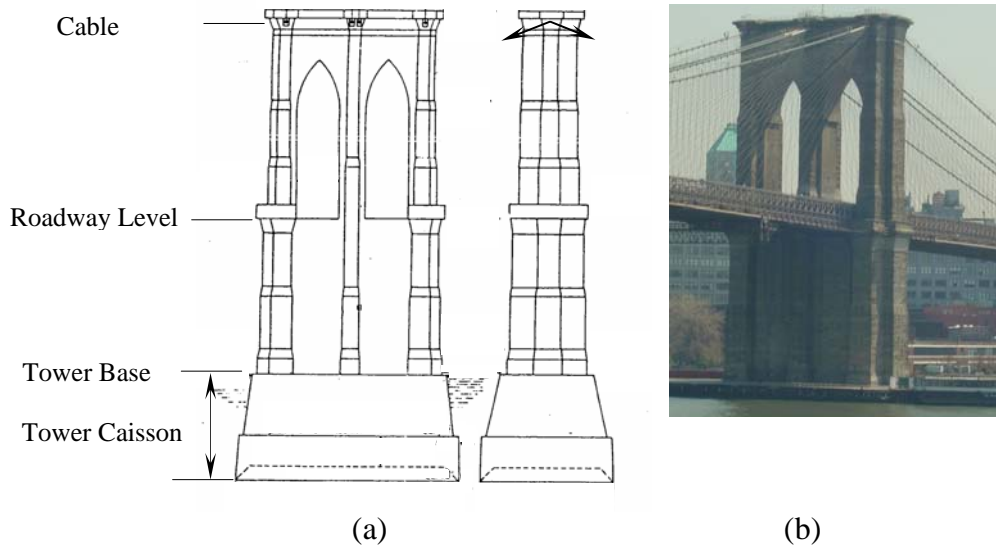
a) elevations of the Manhattan and Brooklyn Towers and their caissons, b) Brooklyn Tower
